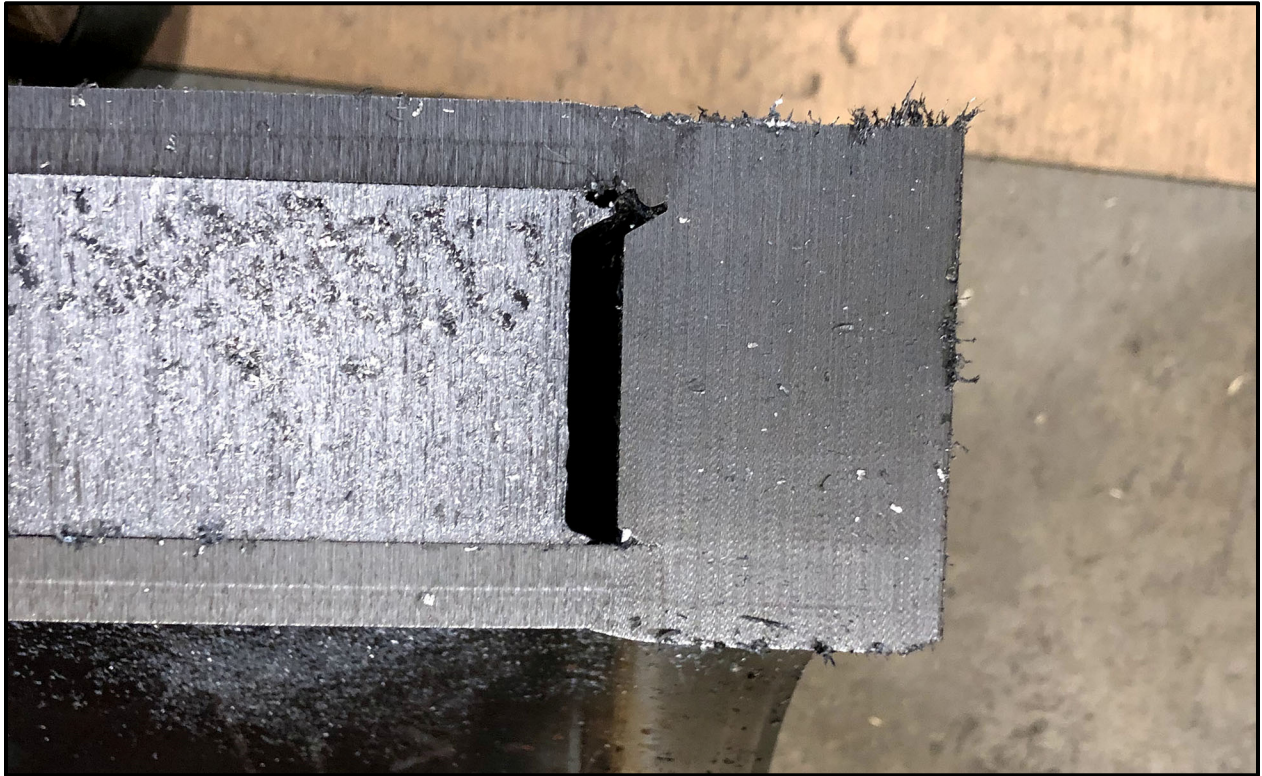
SC-55G2 18TU-09 Destructive Disassembly Cut A at Upper Flange
